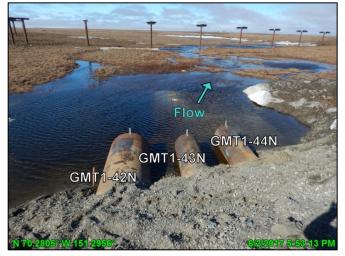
Culverts GMT1-42 through 44, looking northeast; June 2, 2017
